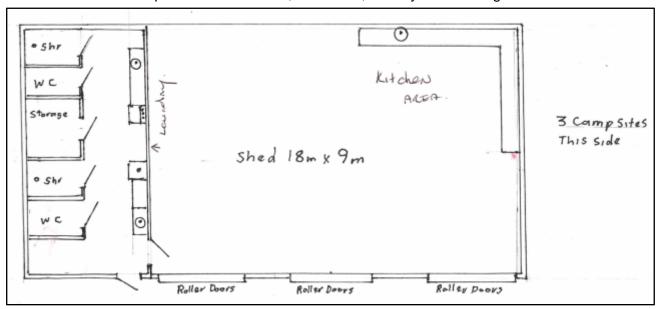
CONCEPT PLAN OF THE ABLUTION AND KITCHEN BUILDING (3x sites are shown and another 3x sites will be provided on the other side of the facility).
